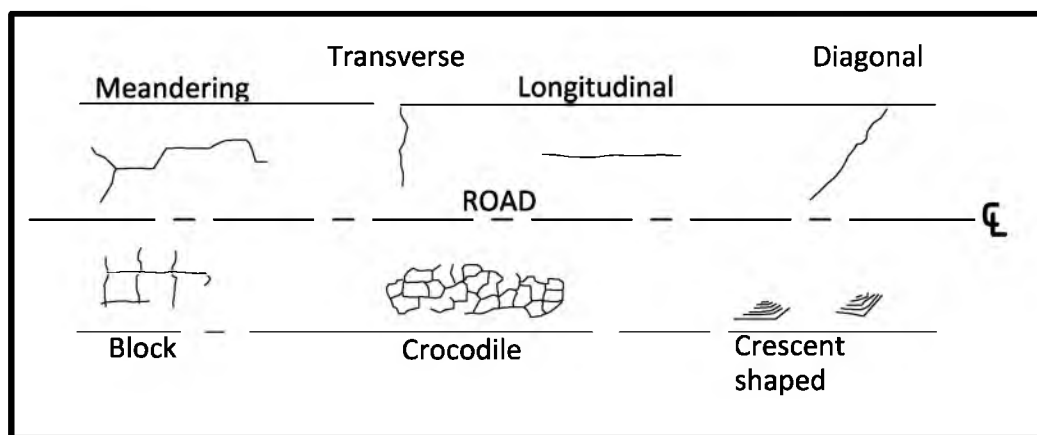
Types of cracking defects in sealed flexible pavements (Austroads 2006)
